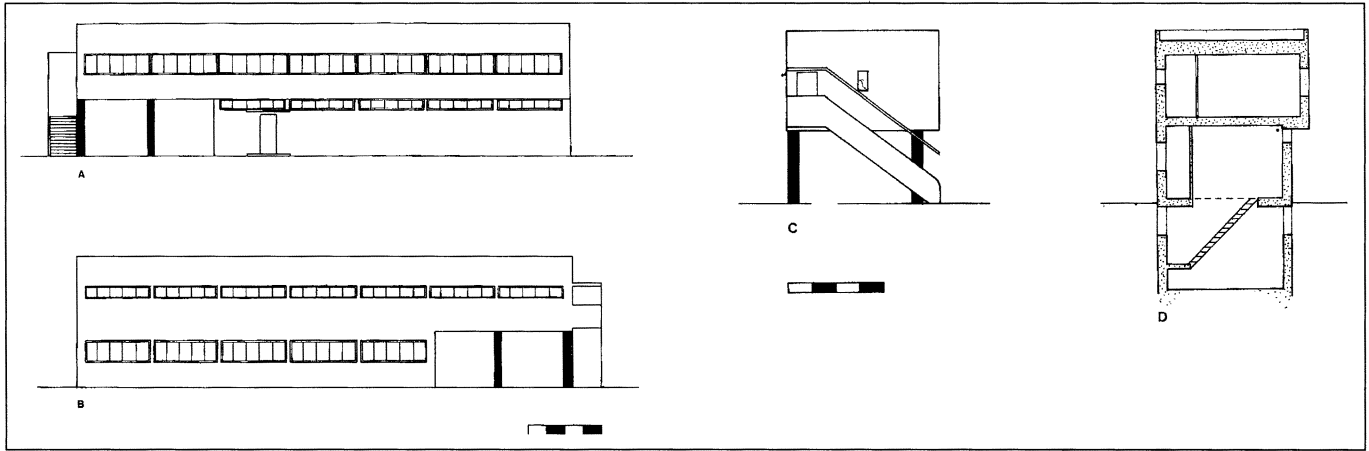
Mechanical laundry building: (A) east elevation; (B) west elevation; (C) north elevation; (D) east-west section, c. 1928. Author's drawing after the original, 1990
